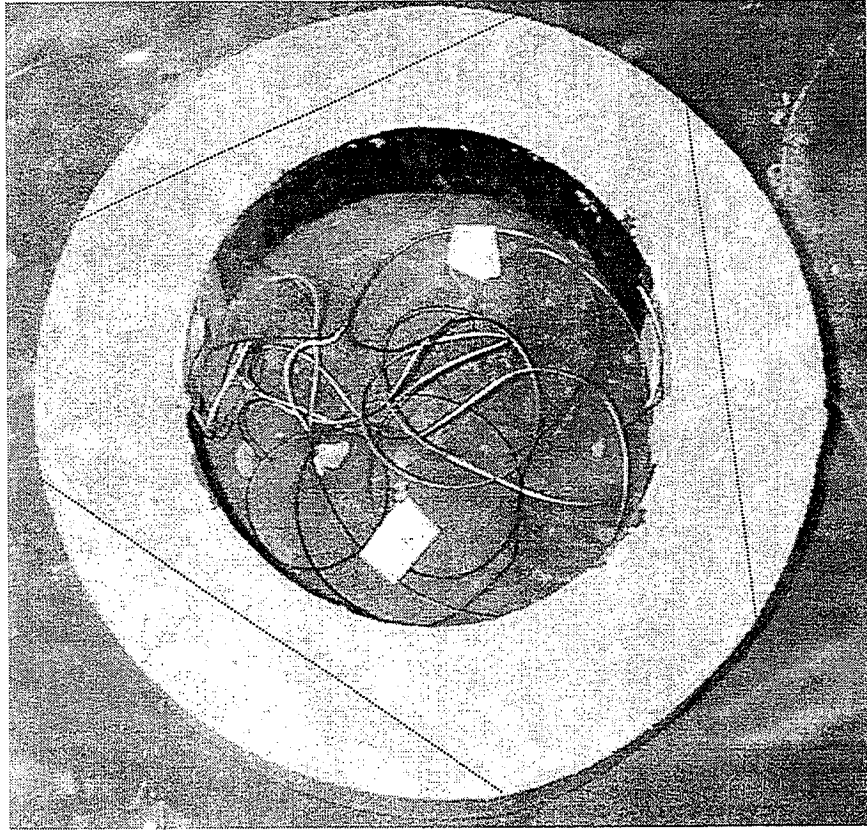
Ring Test Specimen Showing Typical Cut Sections for Visual Inspection
